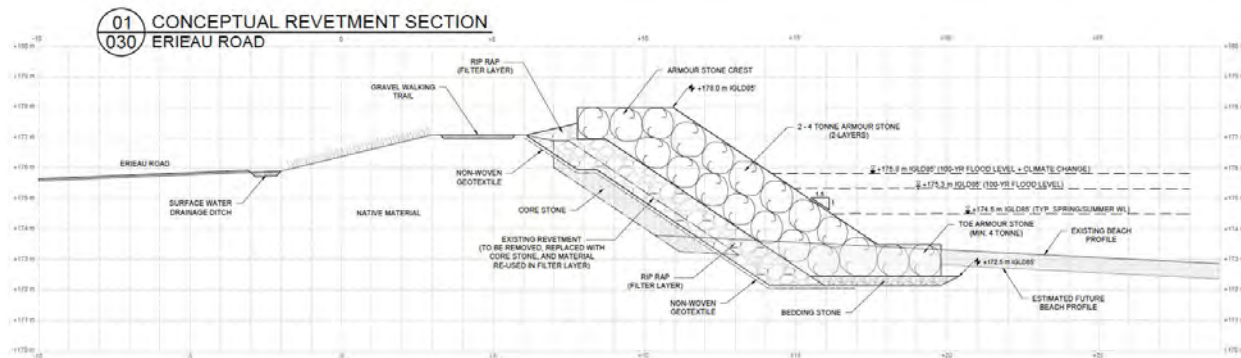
Option 3-2 Cross-section (raised road elevation not shown)
